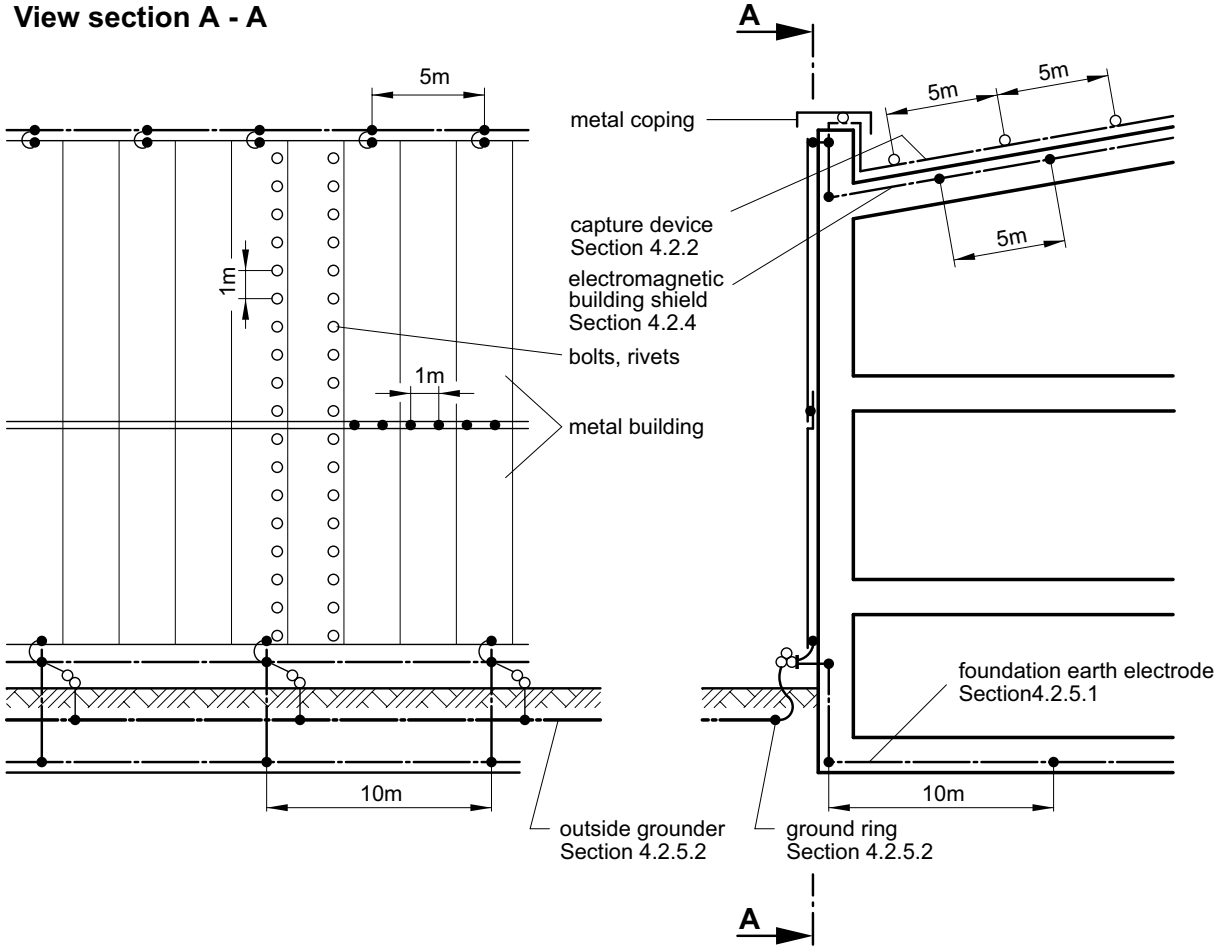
External Lightning Protection system in the case of buildings with metal building fronts (height of lower lip less than 1 meter above ground) and without an external structural seal
